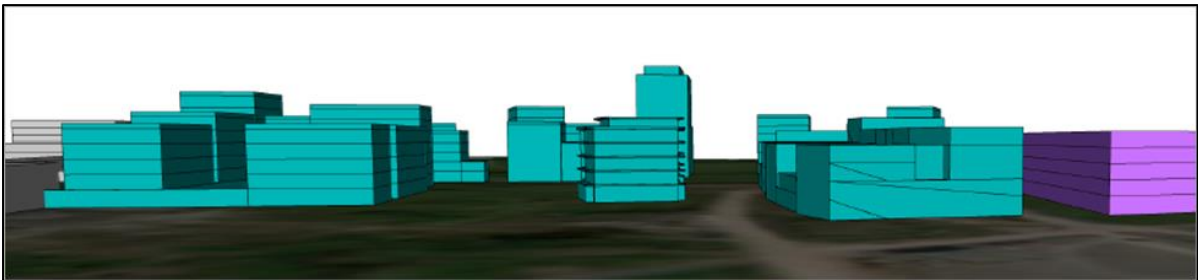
Proposed Project – Elevation Layout of E Blocks
